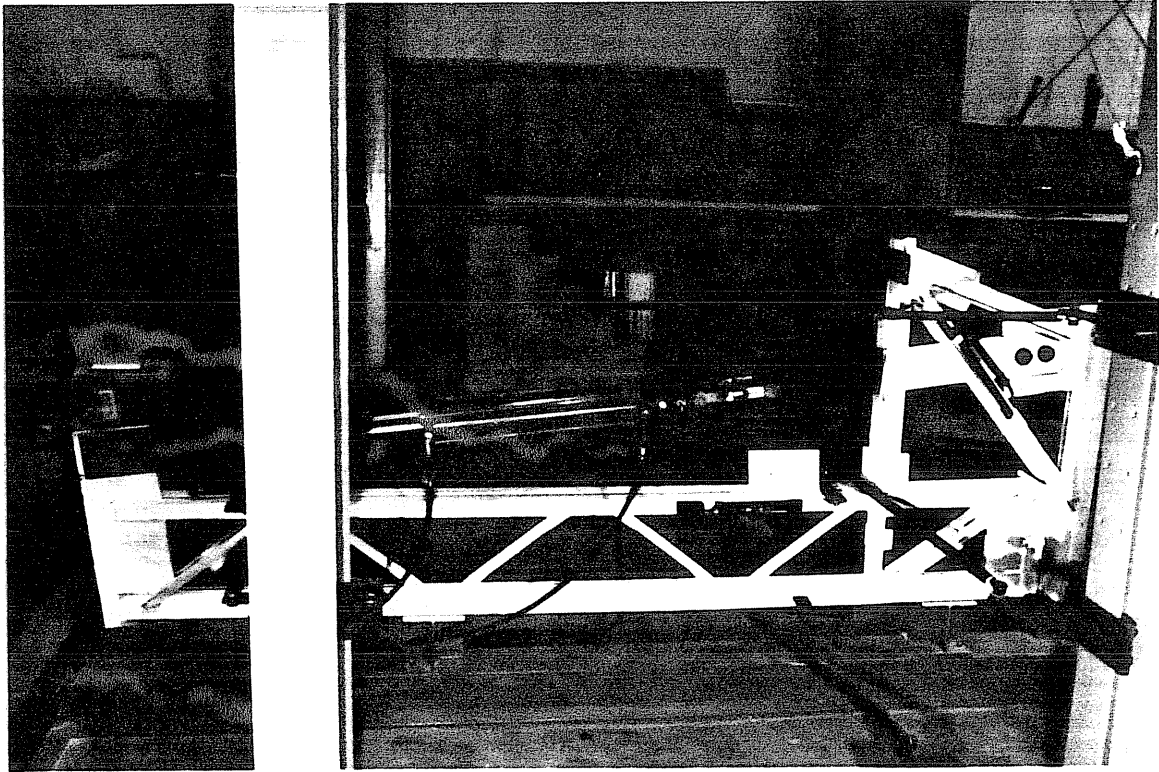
ELEVATION VIEW OF A TYPICAL TRUSS-TYPE RIGID FRAME WITH EXPERIMENTAL CONNECTION DETAIL
